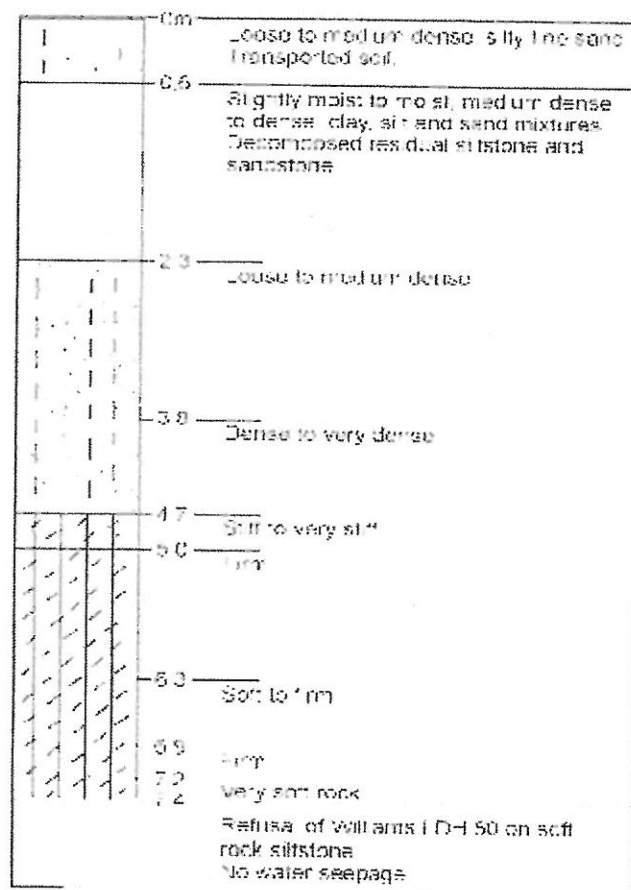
Simplified soil profile at site of rail over road bridge on the Ecca series of the Karoo sediments.
